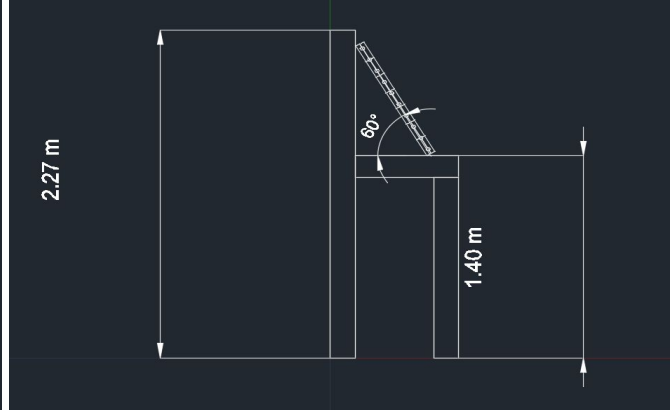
Side view of wooden frame, used to demonstrate dimensions
